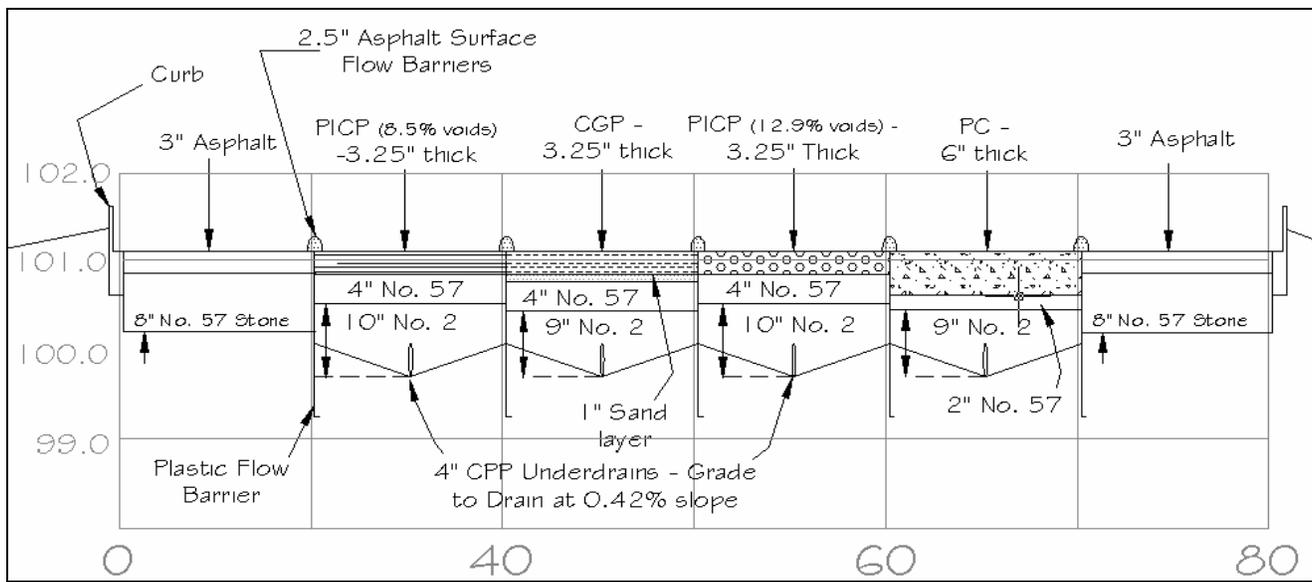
Parking lot cross section (measurements in ft and “ = inches; 1 inch=25.4 mm)
